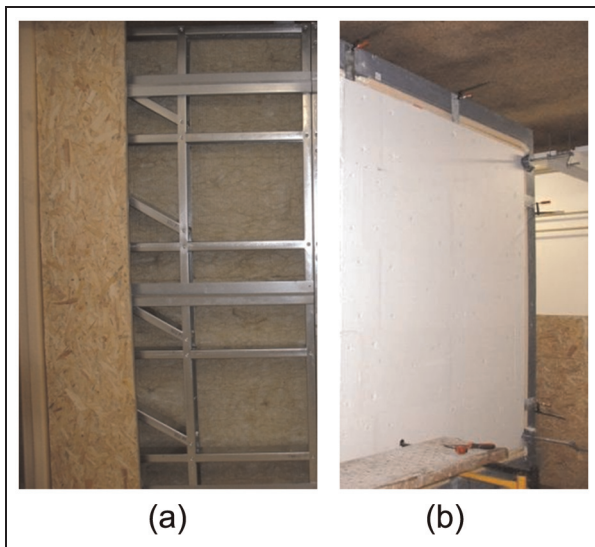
Photographs of the wall module assembly: (a) inside view of the LSF wall structure and (b) external thermal insulation (EPS). LSF: lightweight steel framed; EPS: expanded polystyrene.
